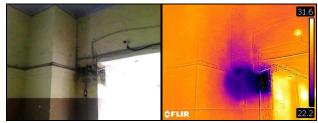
Infrared Detection of Leakage on wall from Damaged Plumbing Joint near Structural Department
